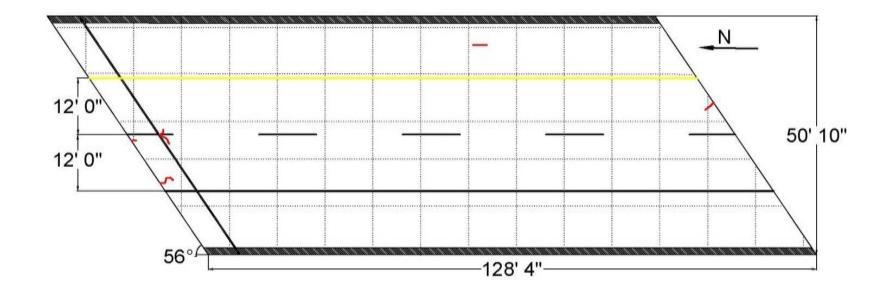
Distress map for Dannon Way southbound conventional concrete deck at 5 months.
